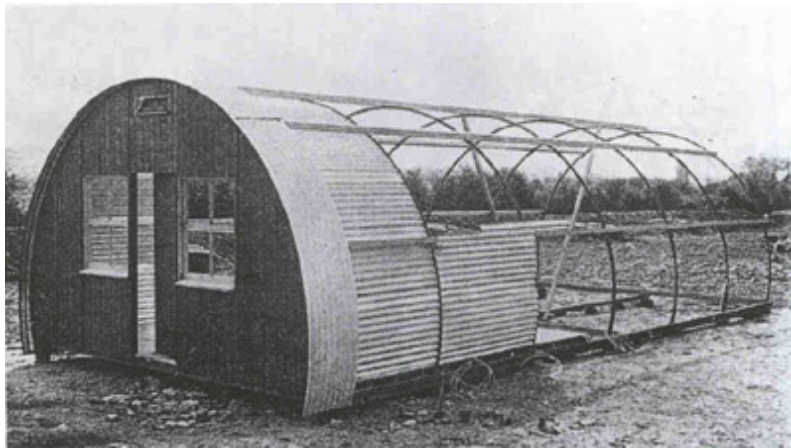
Stage 4 End panels were fixed into position and the internal lining added. The exterior corrugated iron skin was fixed.
